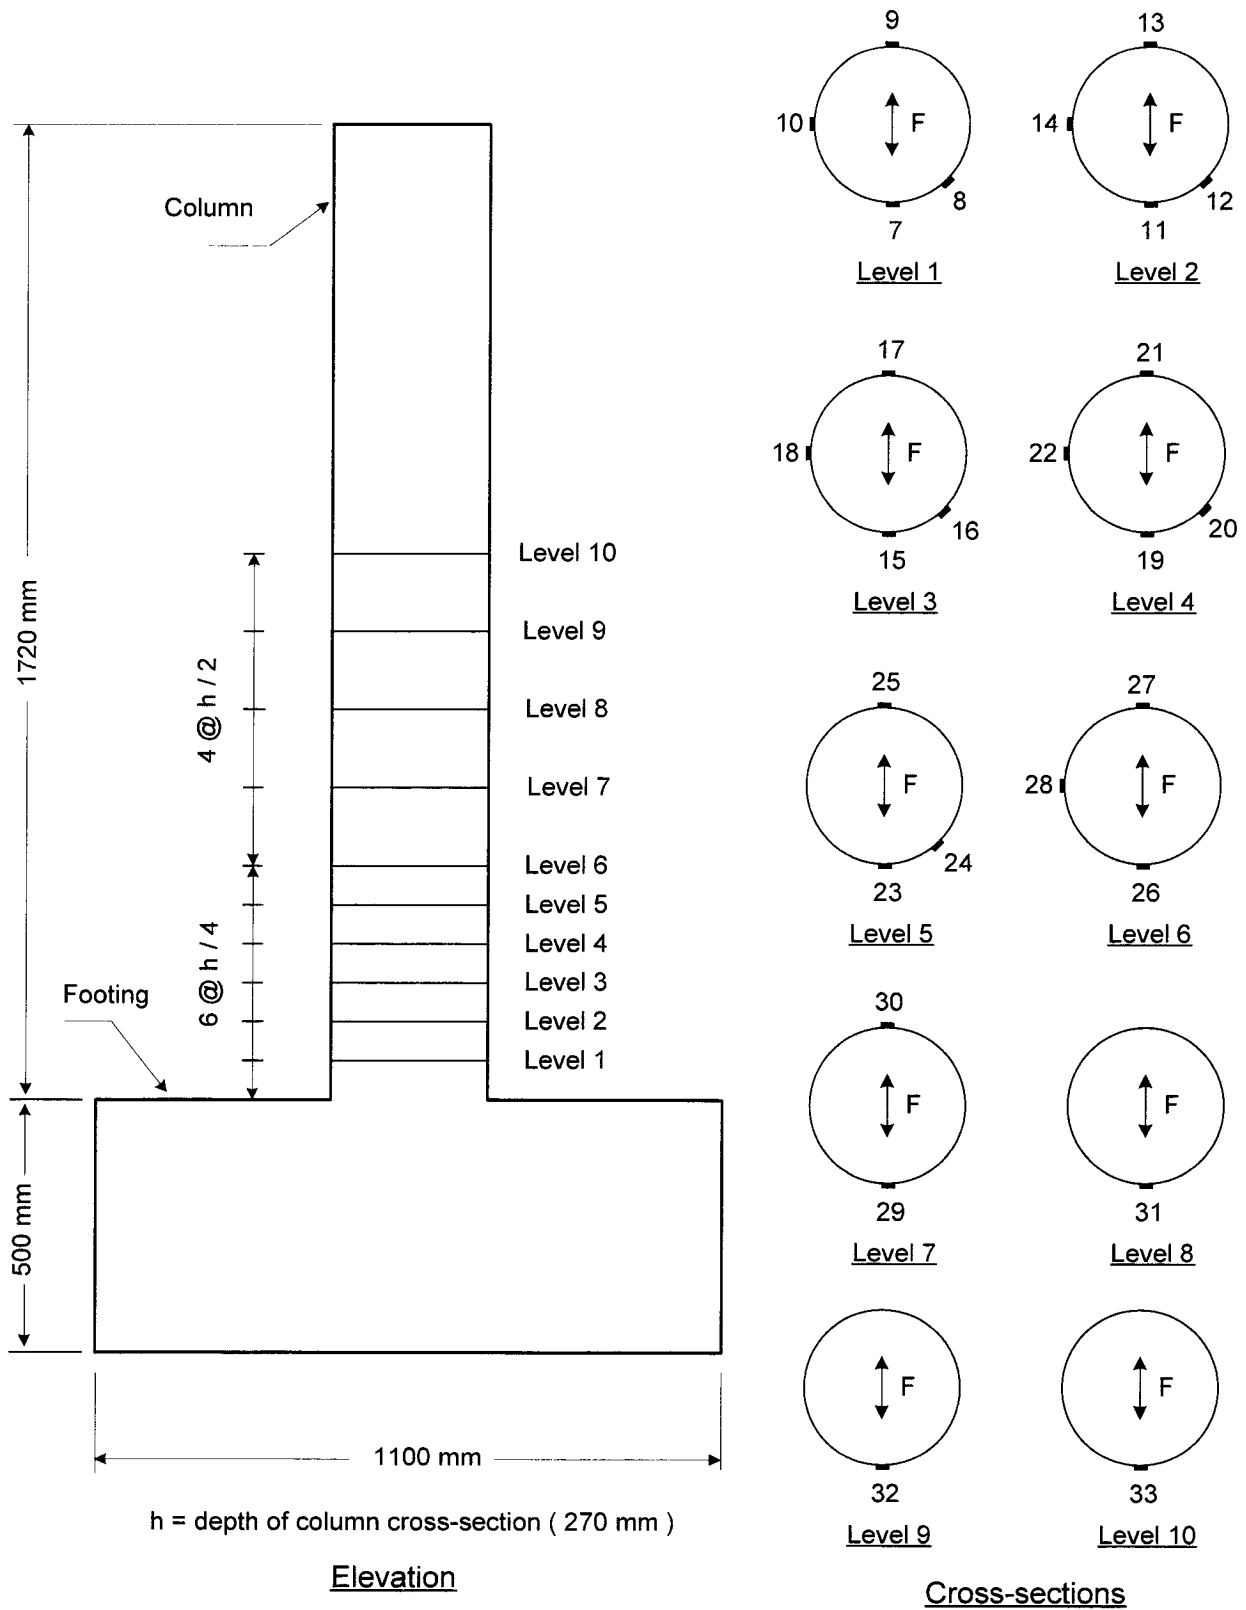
Configuration of LVDT's on a Typical Specimen
